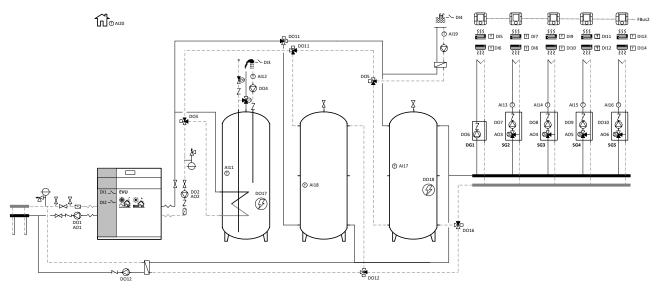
Wiring scheme using two buffer storage tanks (VOLTA W-H-A models).
